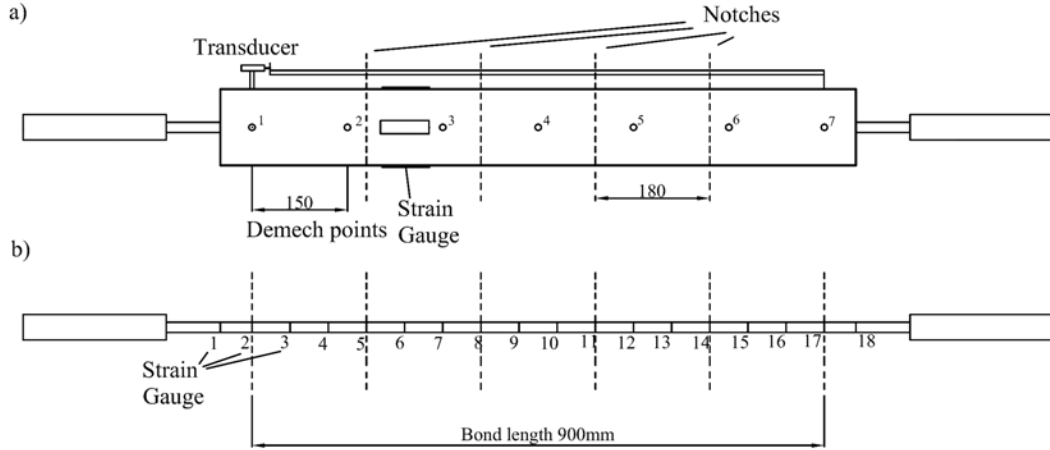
(a) External instrumentation of the concrete specimens. (b) Internal instrumentation of the GFRP reinforcing bar.
